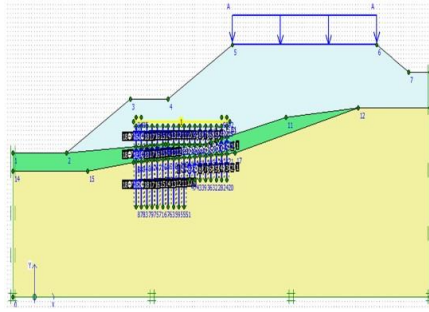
Modeling with Mini pile & Geotextile Reinforcement
